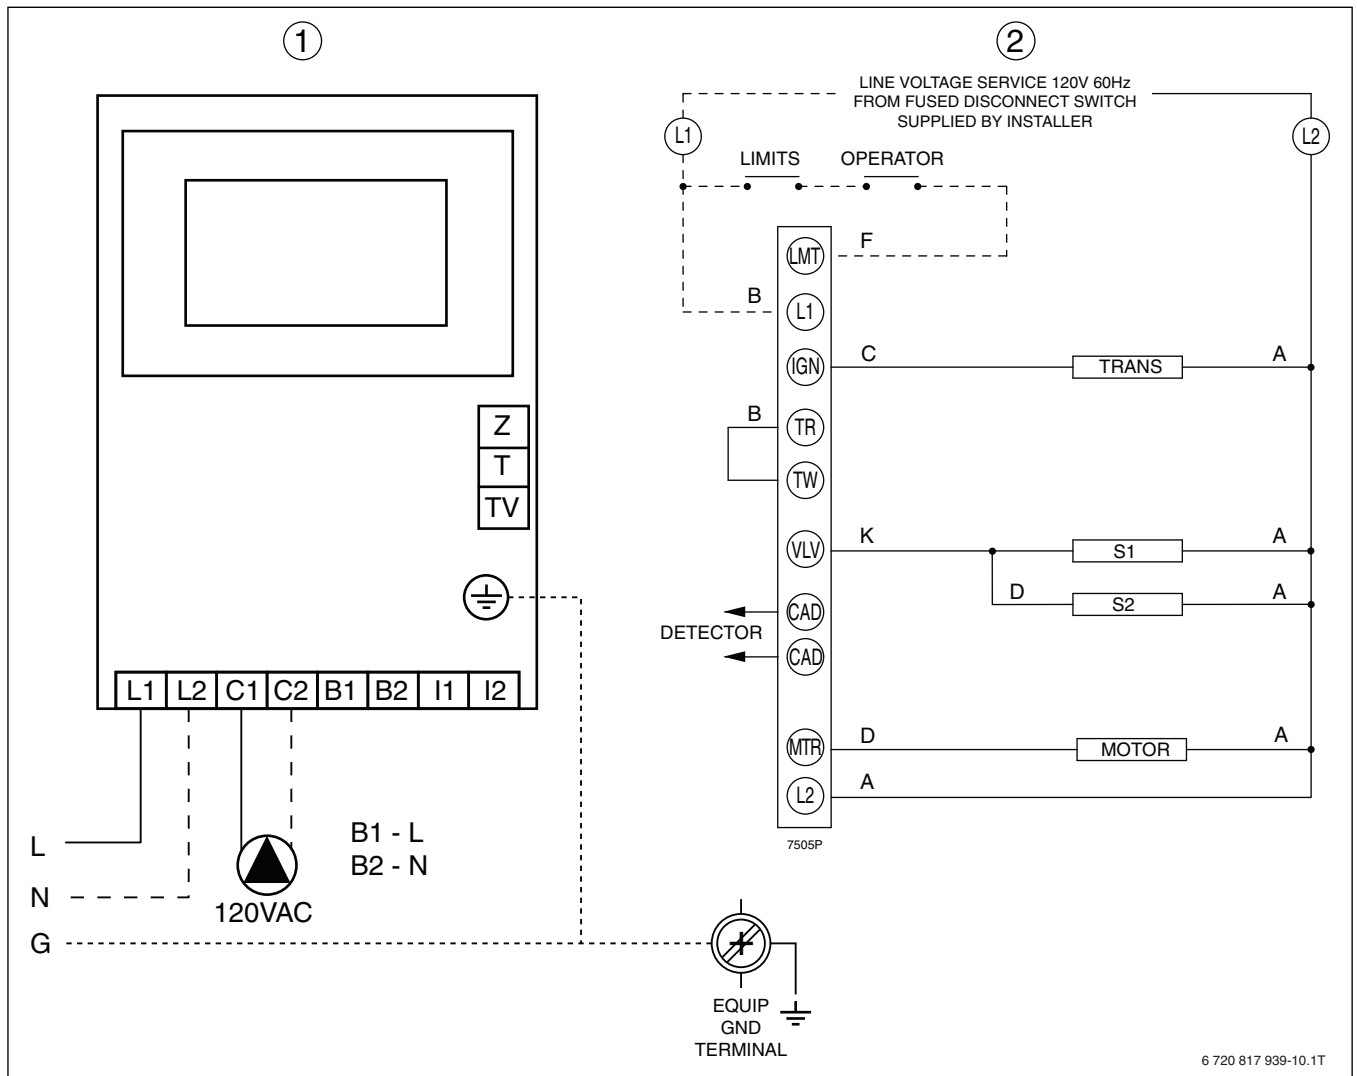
Wiring Hydrolevel with Beckett CF500/CF800 (for 120V burners only)
